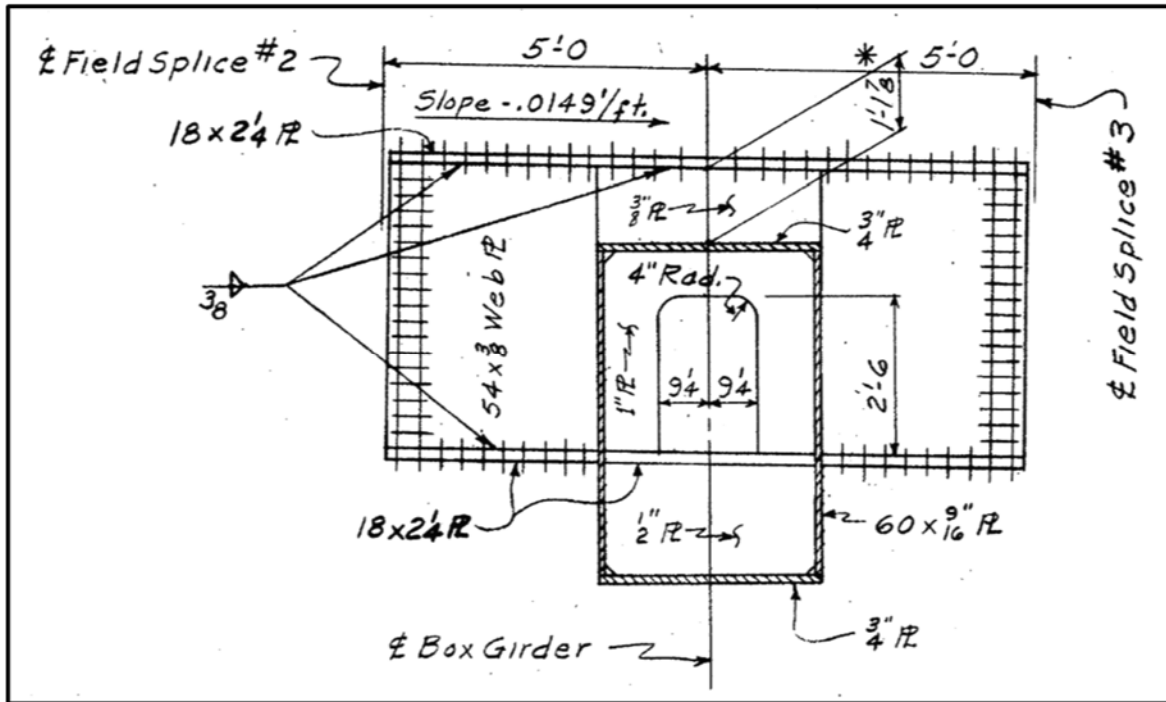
STA-077-0912 – Integral steel box girder original typical section
